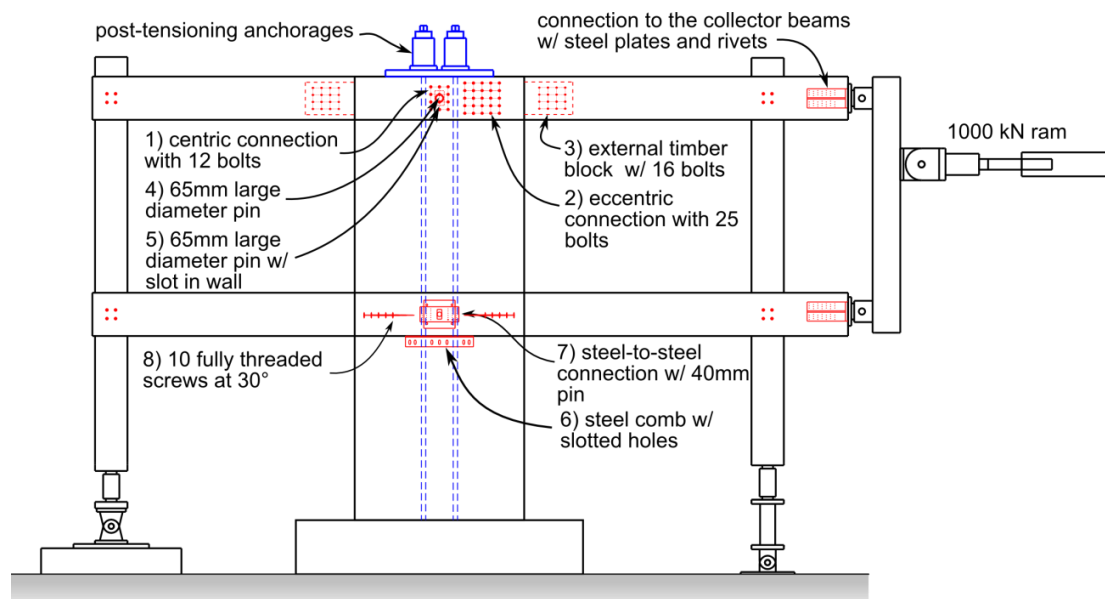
Diaphragm-to-wall connections: 1) central connection with bolts; 2) eccentric connection with bolts; 3) external timber block with bolts; 4) 65 mm pin; 5) 65 mm pin with slot in wall; 6) steel angle with slotted holes; 7) steel-to-steel connection with 40 mm pin; 8) fully threaded screws at 30°
